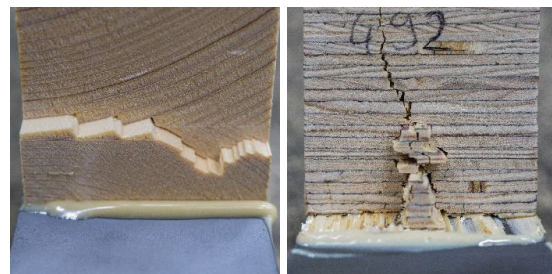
Failed specimen of test with 2K EP and glulam (left) and test with 2K PU, LVL and bolt (right). Splitting was secondary failure and occurred after sudden shear failure
